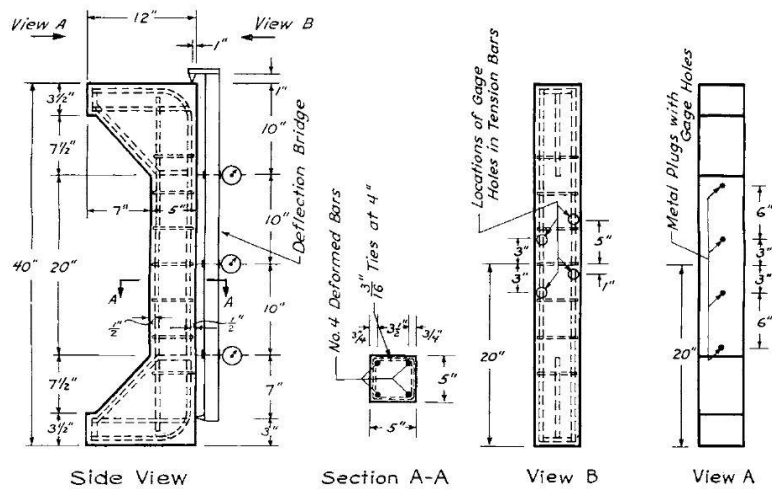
Details of specimens tested by Viest et al. (1956).
